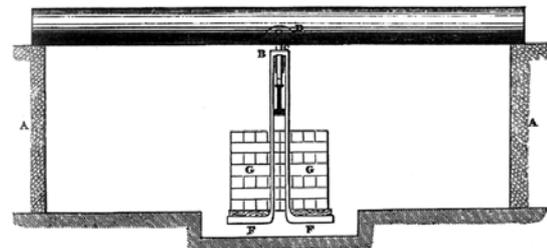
Circular tube being loaded in Fairbairn's test apparatus. (Fairbairn¹)
